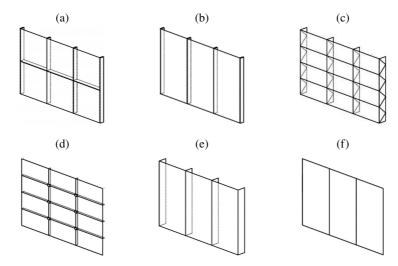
Structural systems for facades: (a) mullion-transom, (b) mullion-only, (c) truss-supported, (d) cable-supported, (e) glass fin, (f) frameless with oversized glazing
